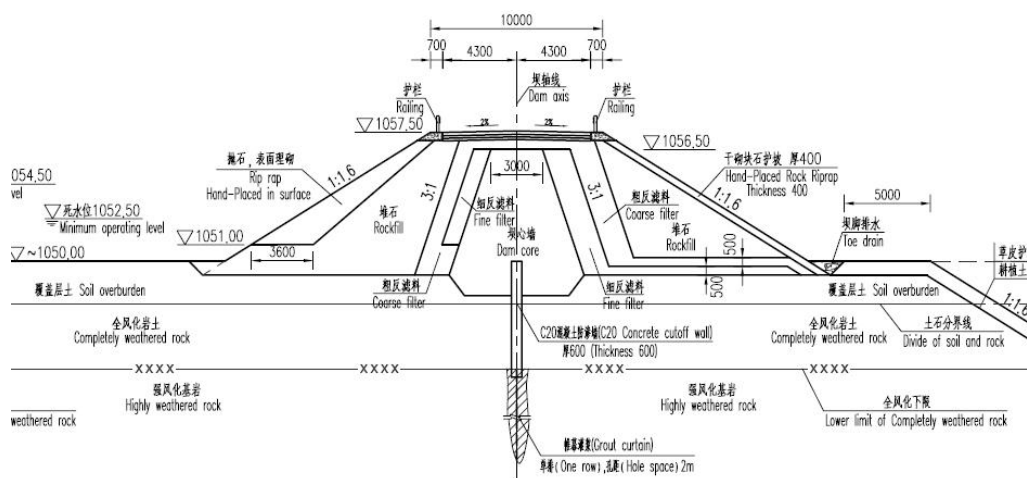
Cross- Section of Left Embankment Dam at Chainage D0+210, showing Concrete Cut-off wall below the central clay core, as part of foundation treatment works. (Adopted from the EPC Contractor's Volume IV of the Basic Design Report)
